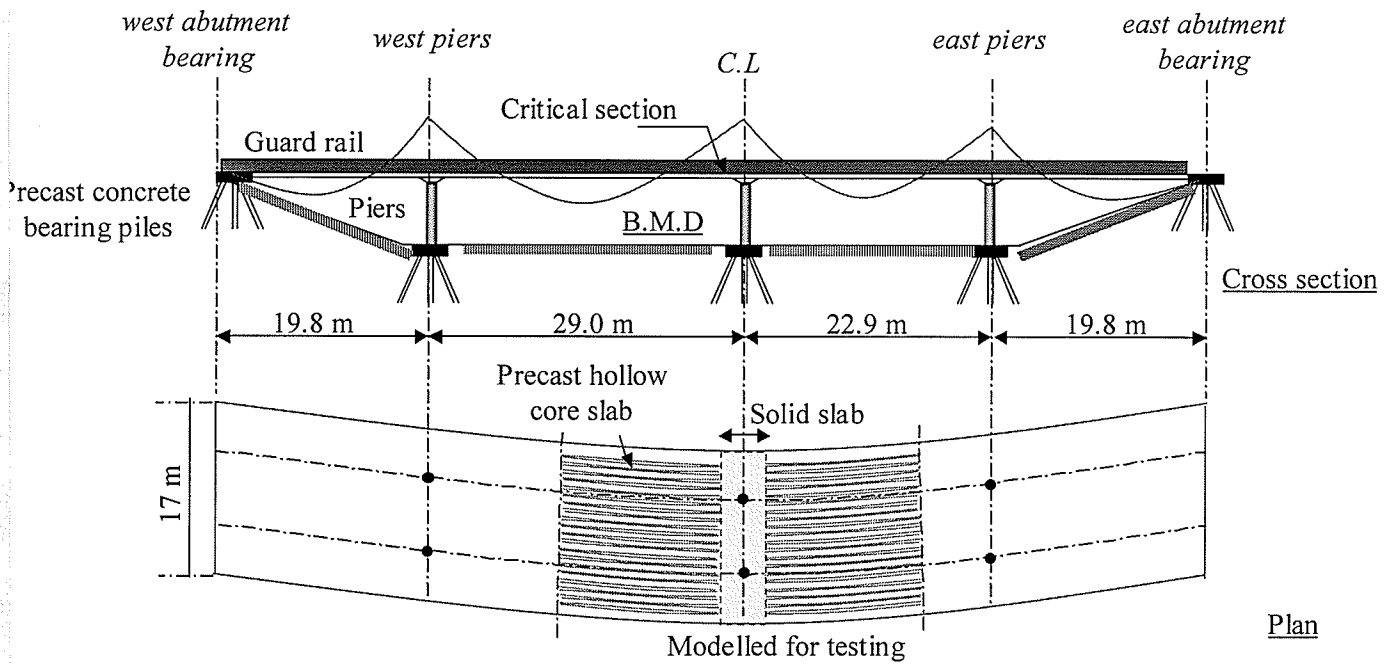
Schematic of bridge No. 444 in Winnipeg – Manitoba - Canada
